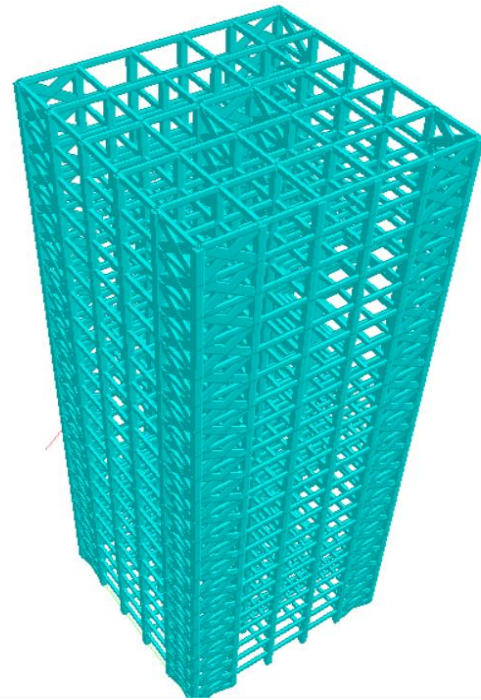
(b): 3-D View of structure with equivalent shear wall
